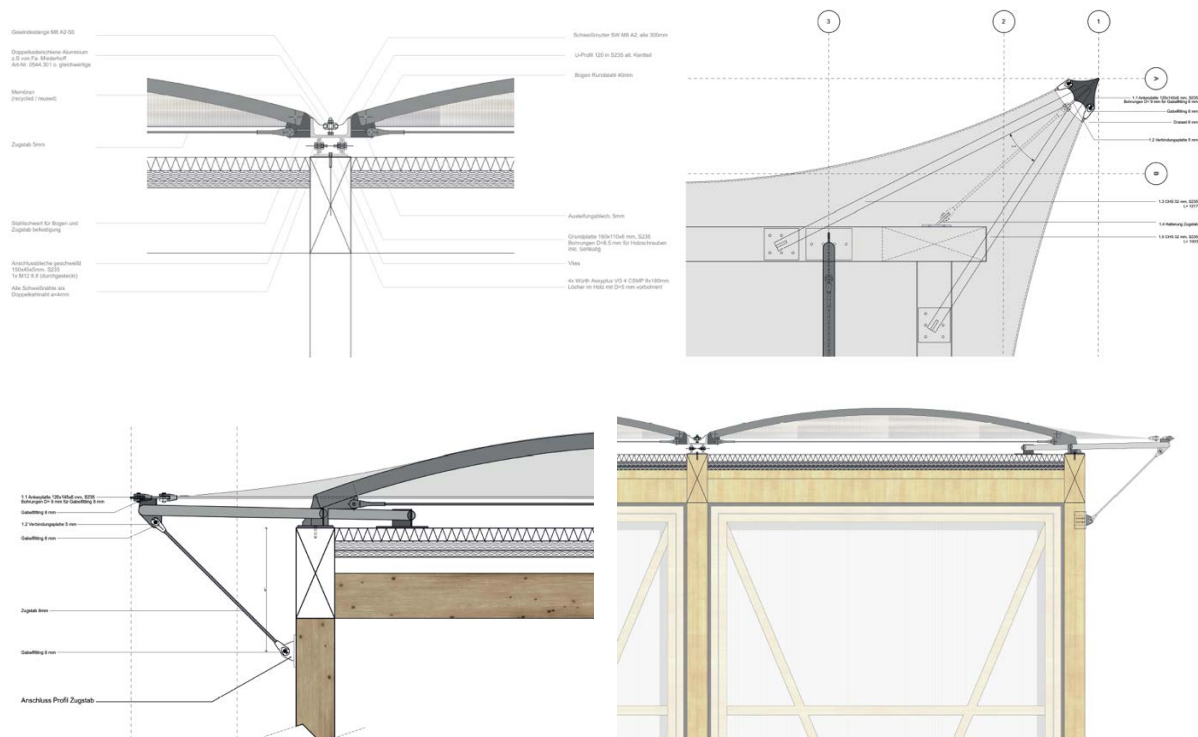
Membrane roof, details, source: HFT Stuttgart.
